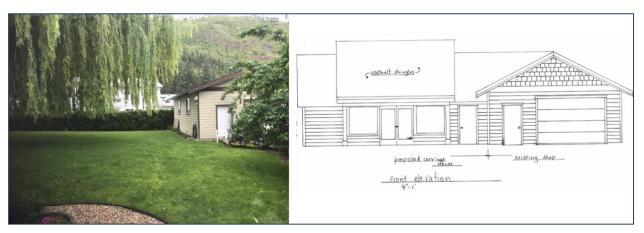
Existing Shop (left), Proposed Carriage House Plan (Right)
